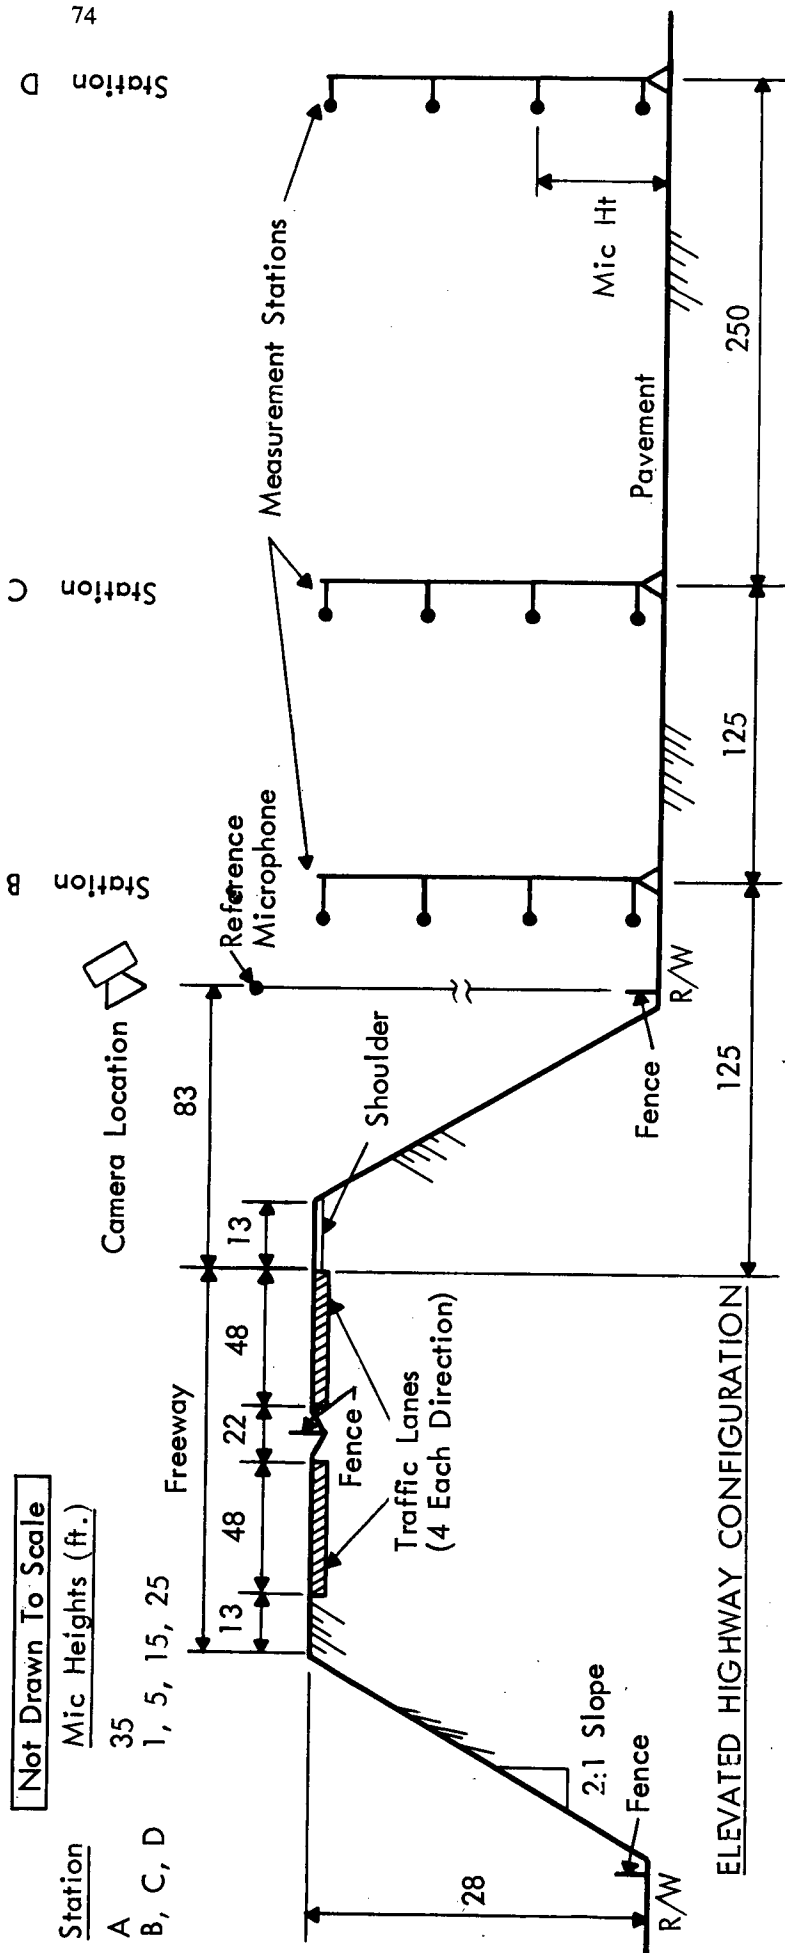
Site cross-section and acoustic measurement stations, Site 3.
